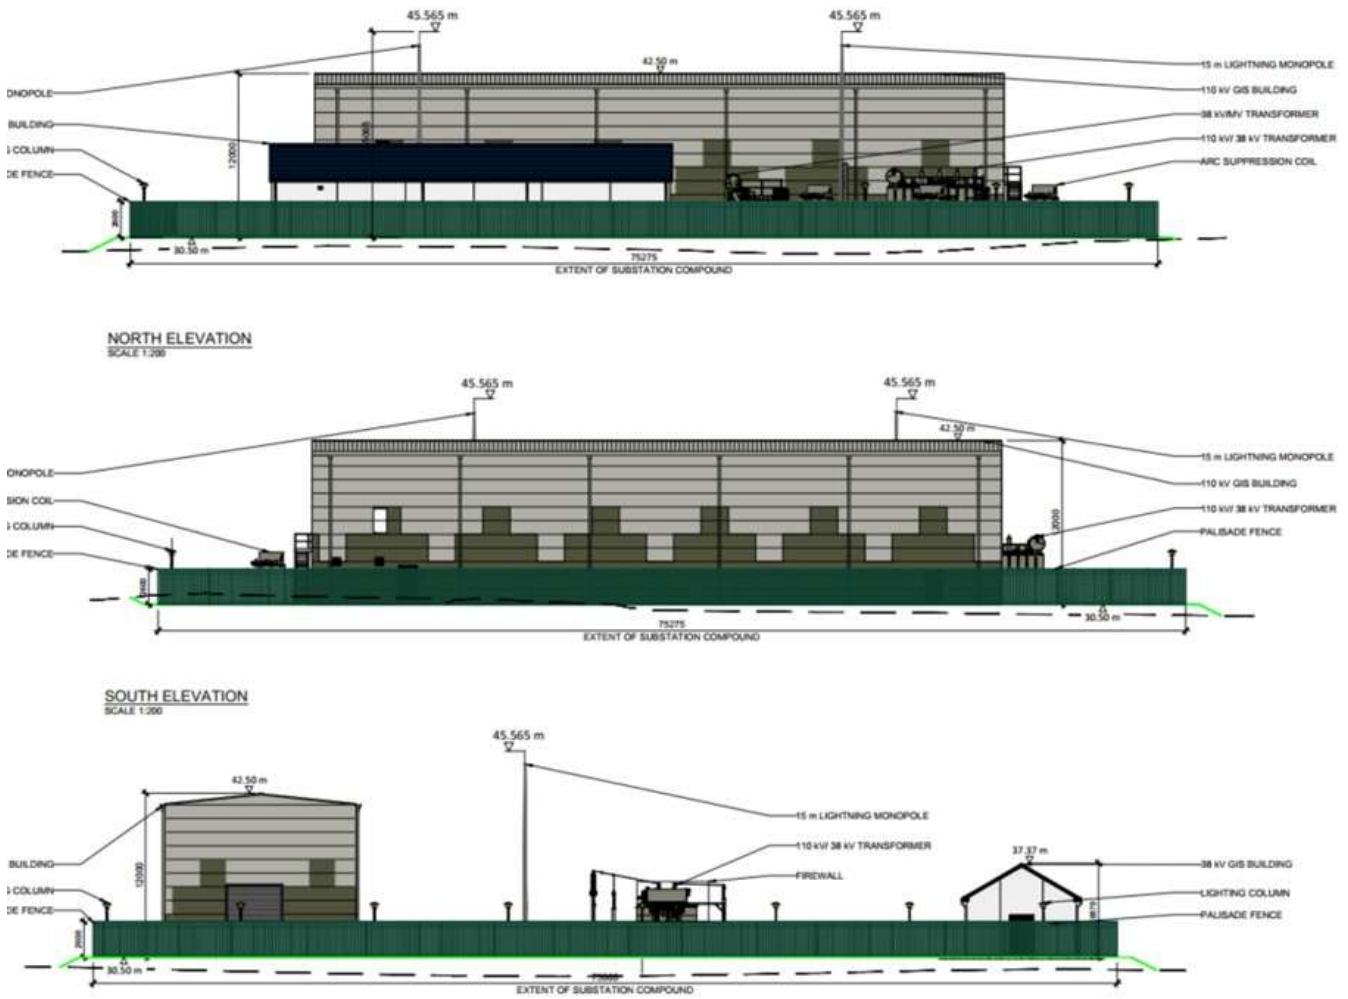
illustrates the layout of the proposed substation, while Figure 2.3 provides a view of the proposed substation elevations. The full size drawings for Figures 2.2 and 2.3 have been submitted as part of the application and these can be viewed separately in the application documents for greater legibility.
